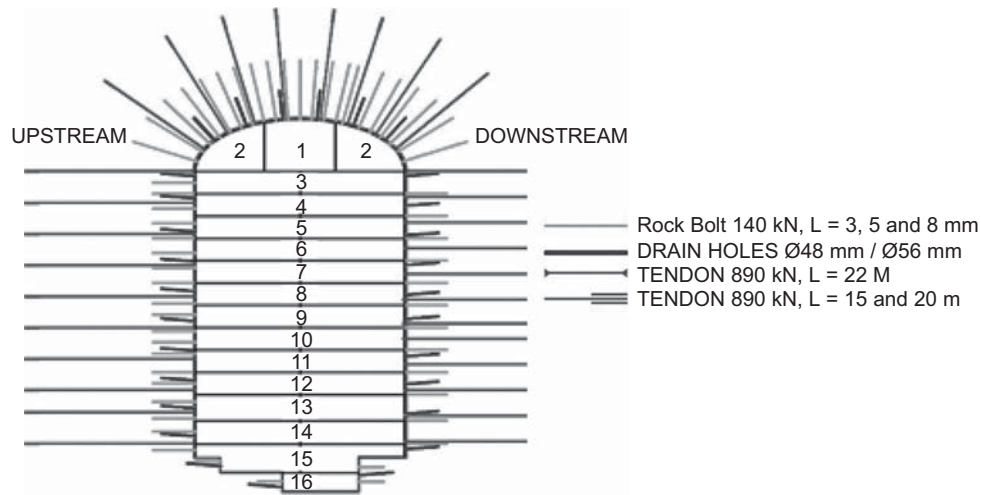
Excavation sequence and typical support system installed in the powerhouse cavern and excavation stages with drainage holes at roof and sidewalls (Sharifzadeh et al., 2009).
